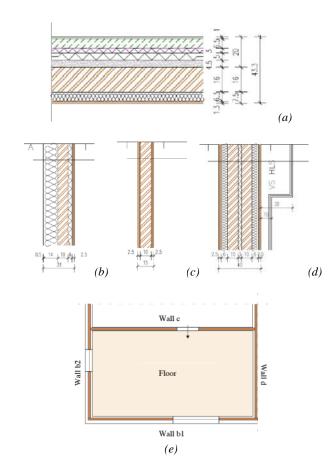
Separating floor (a), external walls (b), internal separating walls (c, d) and distribution of the elements (e) in the plan.
